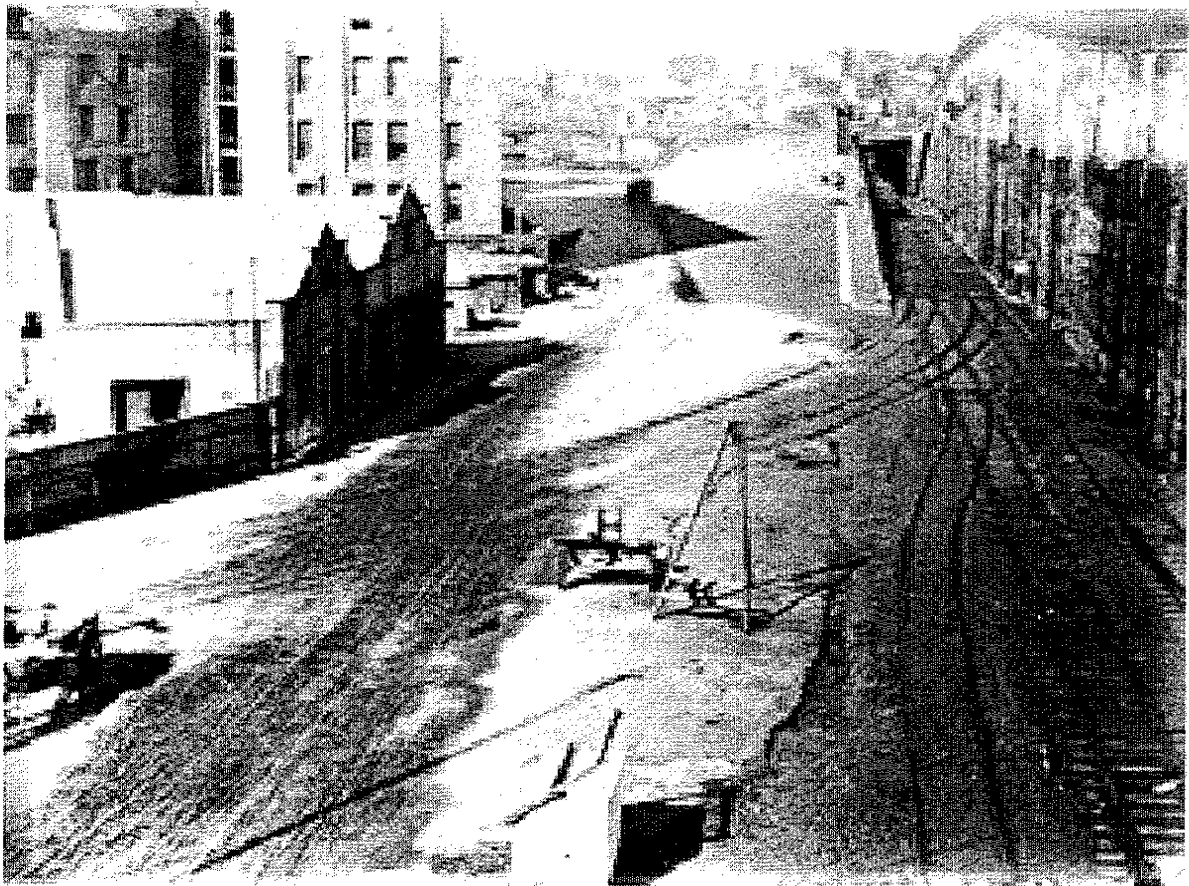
Roadway approach to Jones Bay Wharf looking east from bridge from Bayview Street 1919. Source: ML GPO 121078
